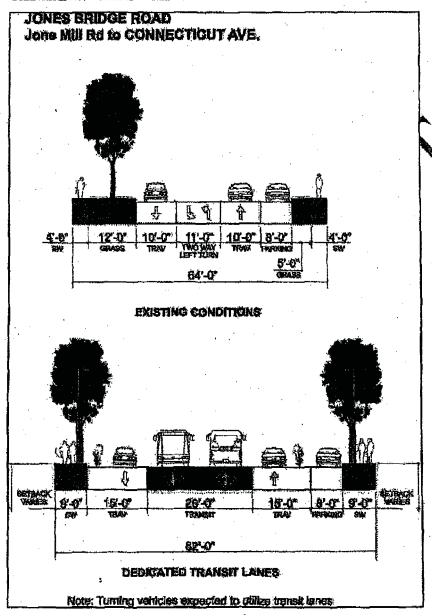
BRT Dedicated Lanes Cross-Section for Jones Bridge Road - Jones Mill Road to Connecticut Ave - Built to Standards
